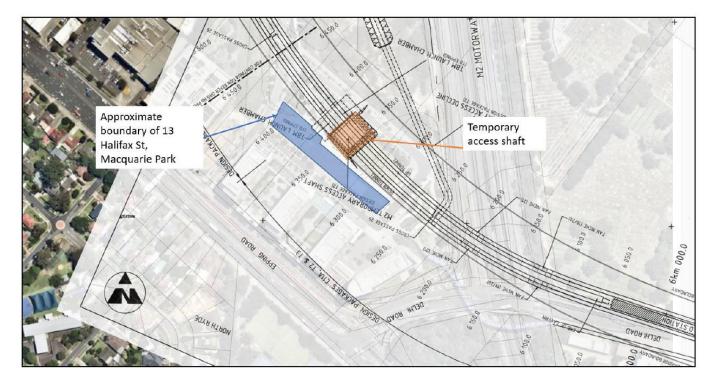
Plan depicting approximate location of site in relation to Sydney Metro underground corridor (Source: Sydney Metro)
